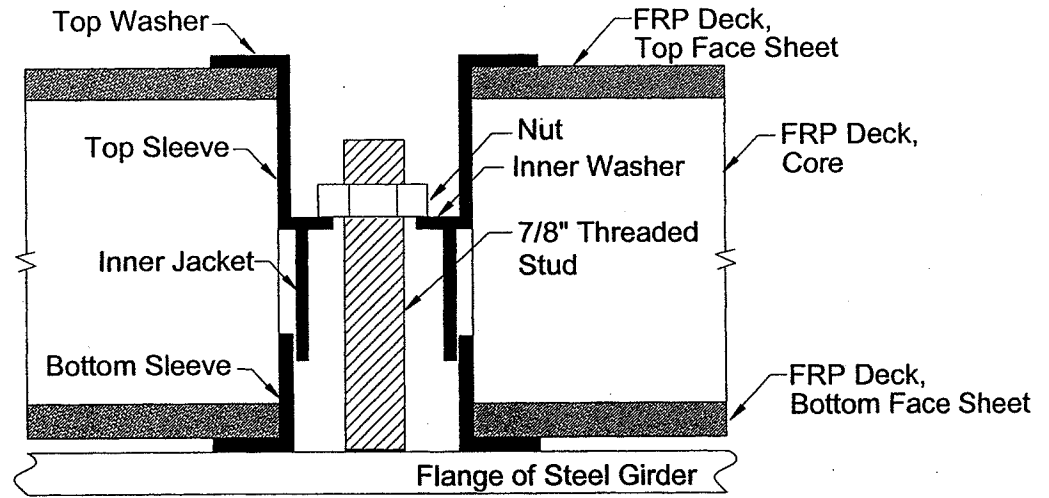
Proposed Connection for FRP Decks to Steel Girders
